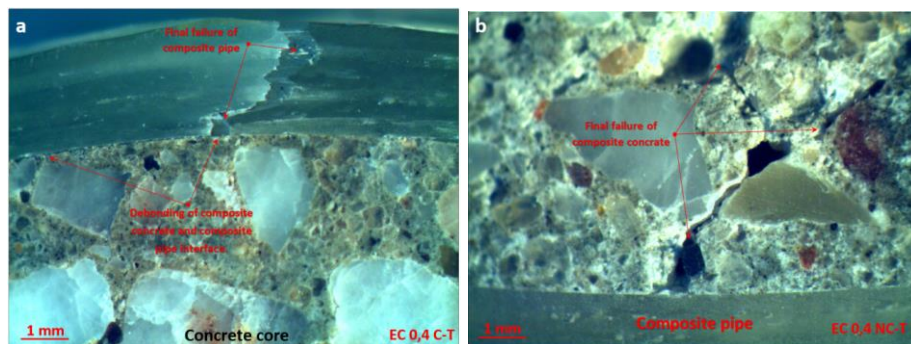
a) Failure of composite pipe and interface between concrete and pipe for Specimen EC-0,4-C-T b) failure of composite concrete for Specimen EC 0.4 NC-T
